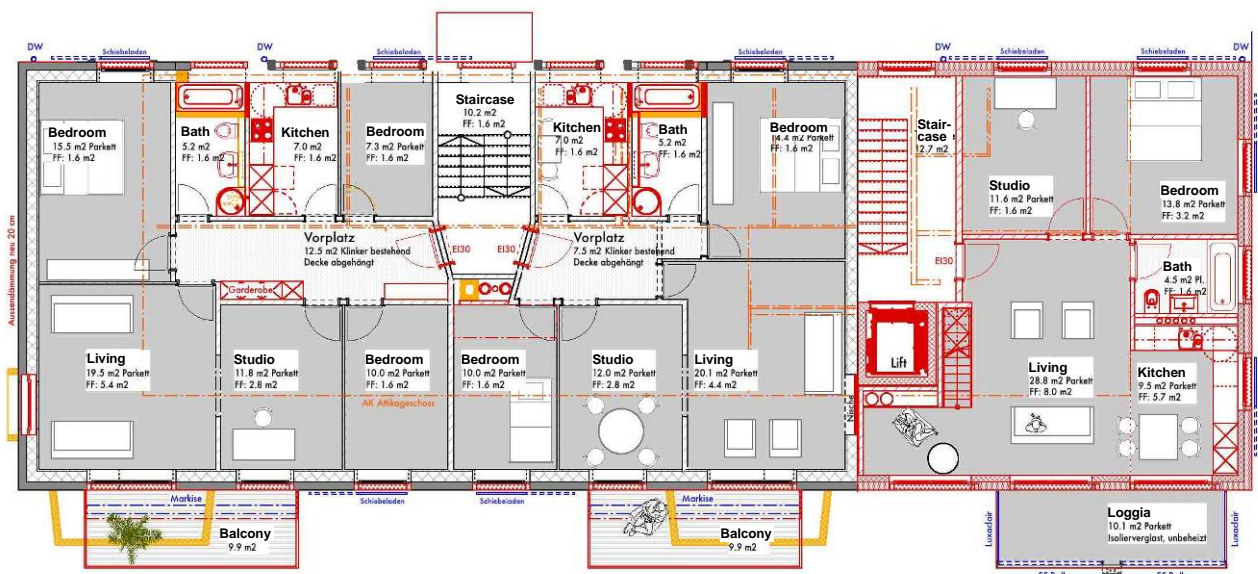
Typical floor plan of building with planned floor plan changes and new building annex (in red)
